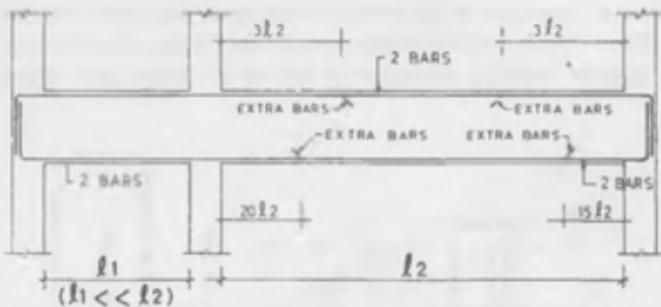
13. Longitudinal section of a two-span continuous beam.
